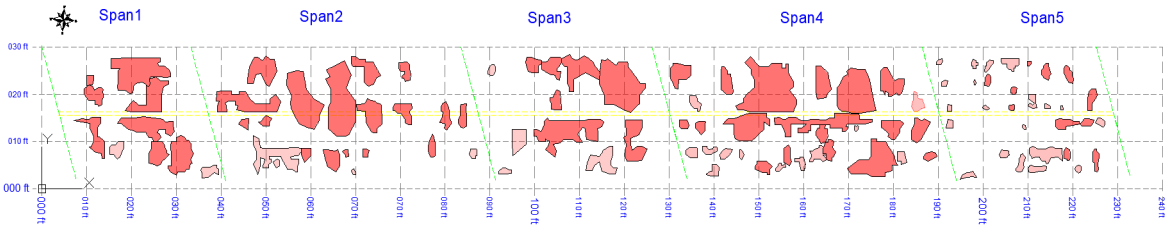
Existing Delamination in the Bridge Deck No. 22387
